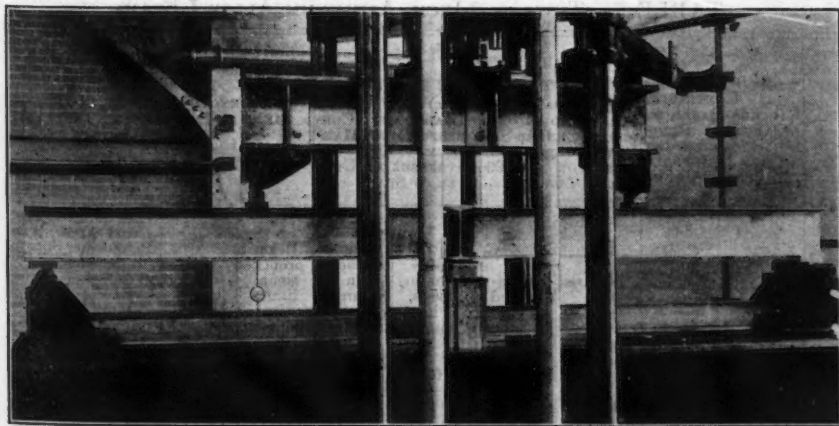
TWO-SPAN BEAM TEST OF SPECIMEN 4.
